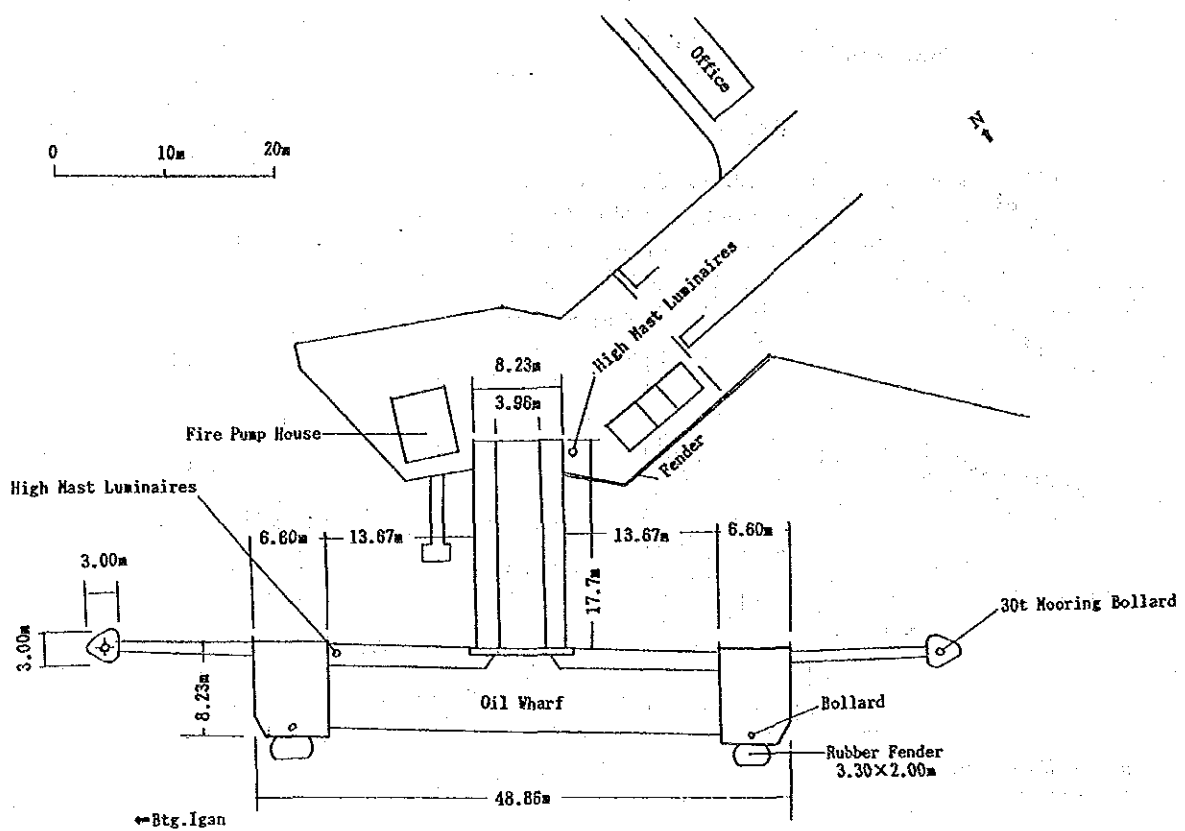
Layout of Existing Sg. Merah Oil Jetty
